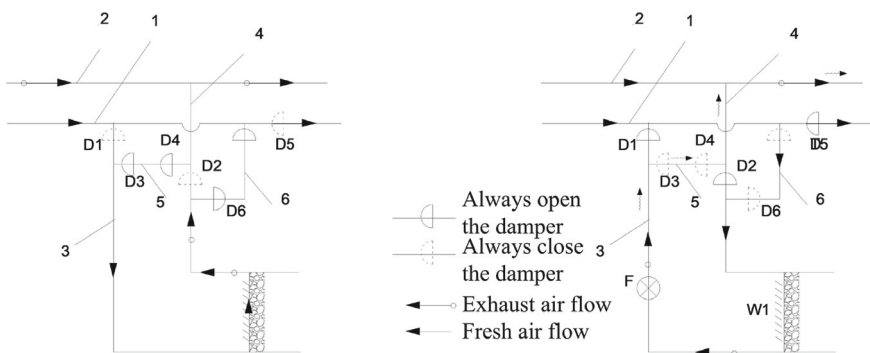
Layout of connection roadway and dedicated air reversing roadway. 1—air intake large roadway; 2—return airflow large roadway; 3—air intake downhill; 4—return airflow downhill; 5—connection roadway; 6—dedicated air reversing roadway
